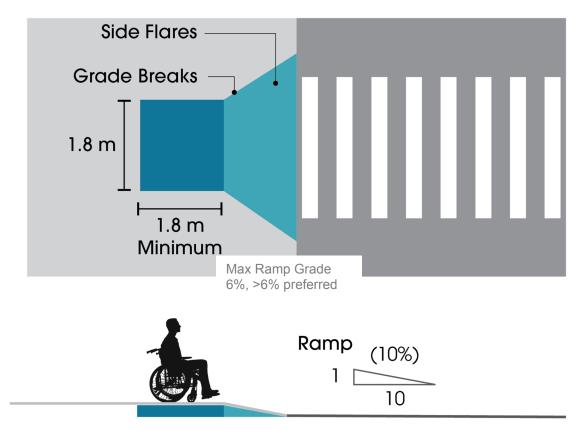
Curb Ramp (Adapted from NACTO Global Street Design Guide)
